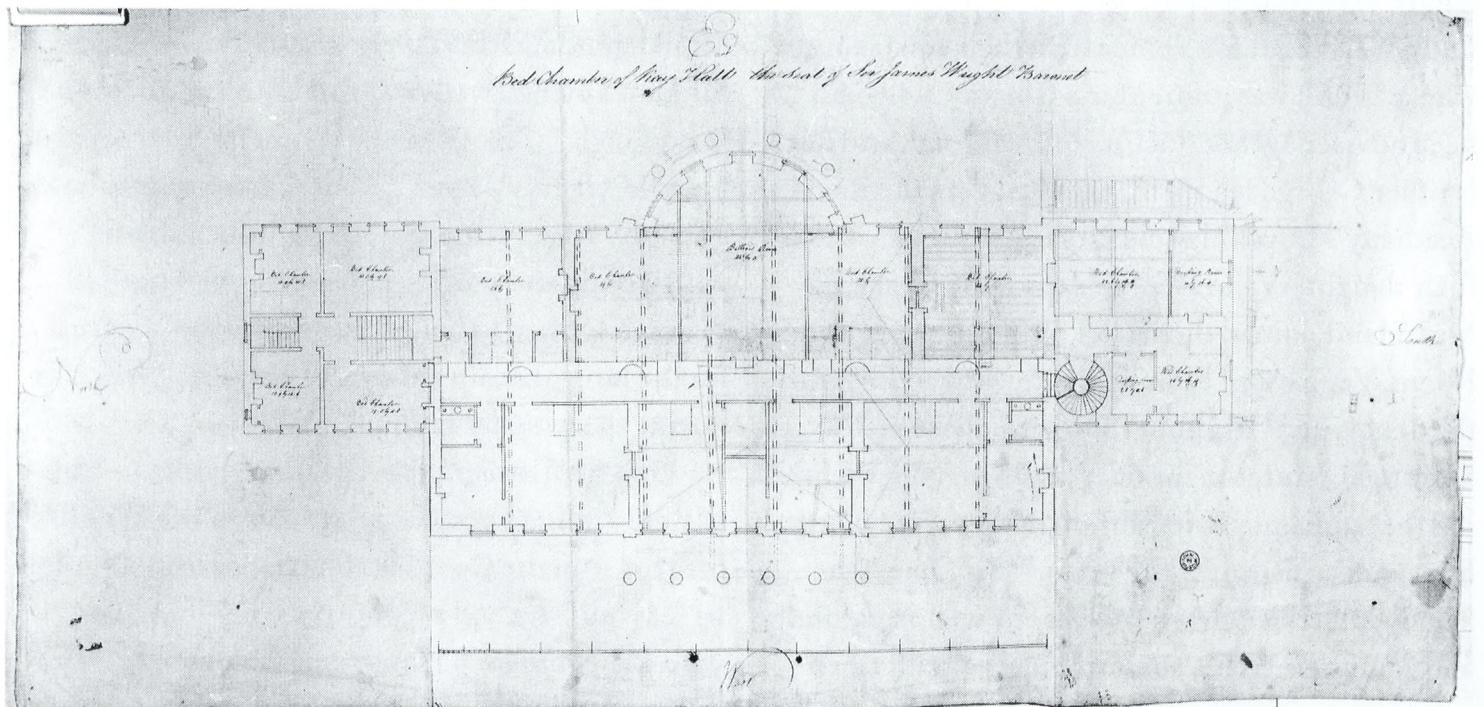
Robert Adam, first floor plan (part survey, part proposal) of Ray Hall, c.1773. *Sir John Soane's Museum.
